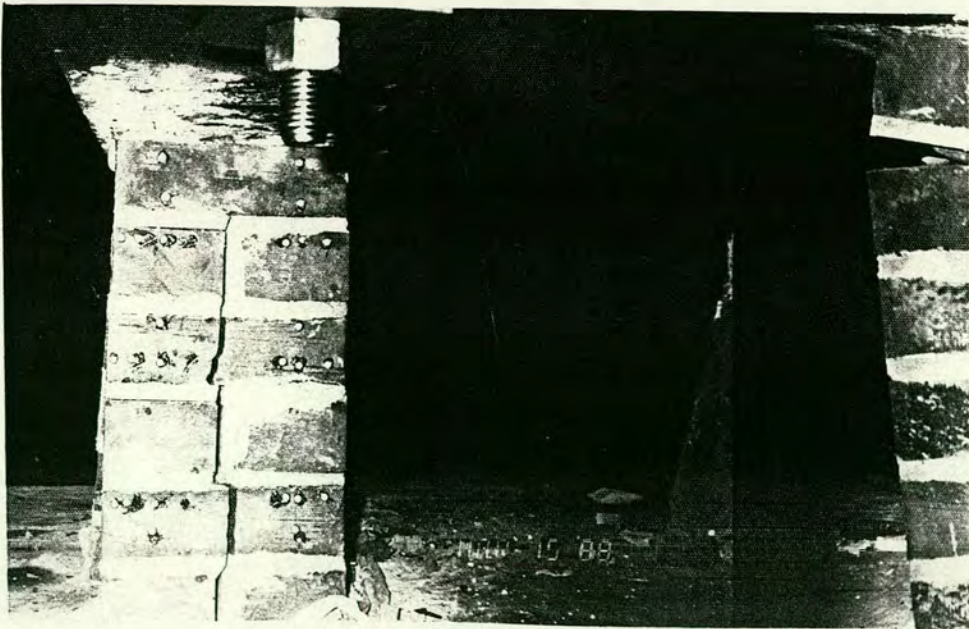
Typical failure mode and crack pattern for concrete infill pocket prisms
